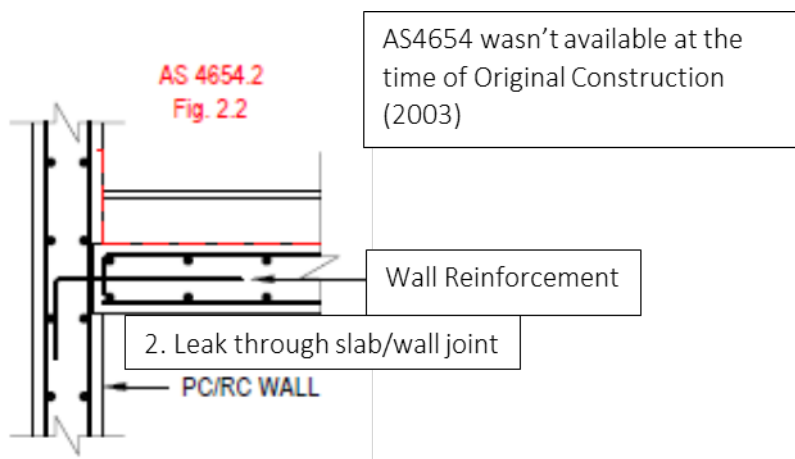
Original details - PC wall/RC slab connection (CI's interpretation)
